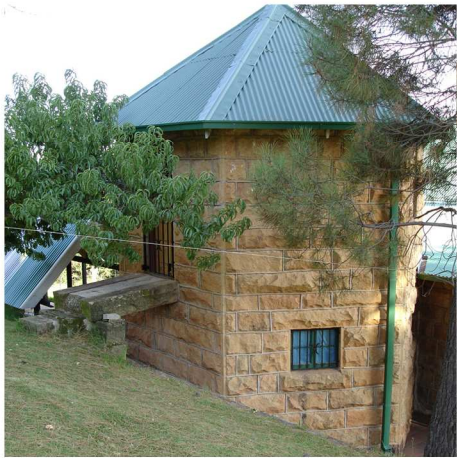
Hexagonal tower behind the house with bridge between upper room and back terrace. (2007)
